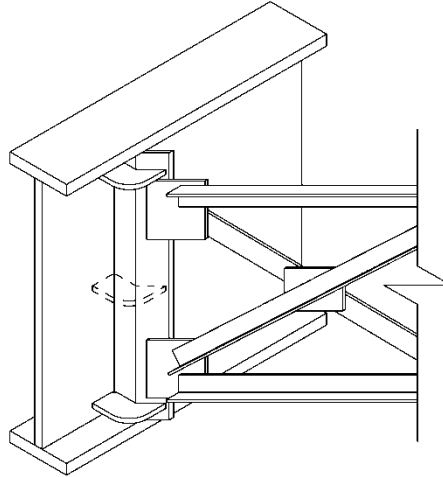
Detail implemented to reduce the flexibility of the bent plate connection
